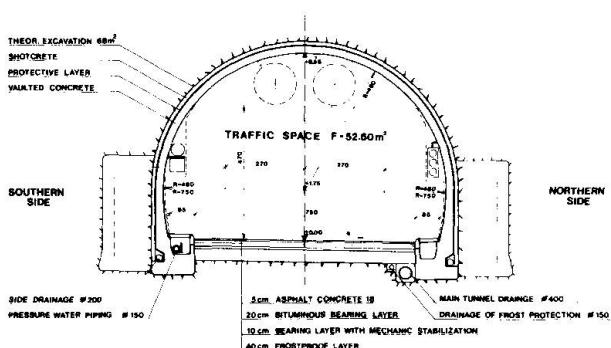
Tanzenberg Tunnel, Southern Tube Standard Cross-Section with Bays
